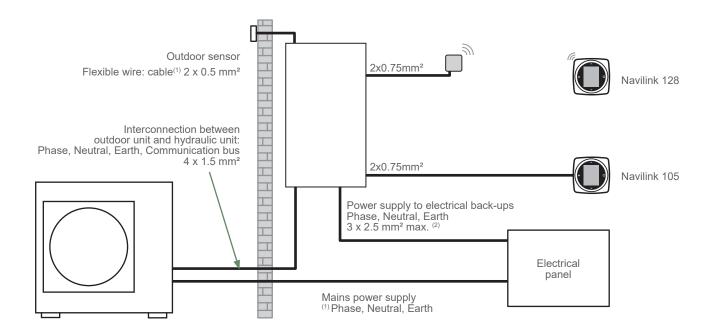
Overall layout of the electrical connections for a single installation (1 heating circuit)
